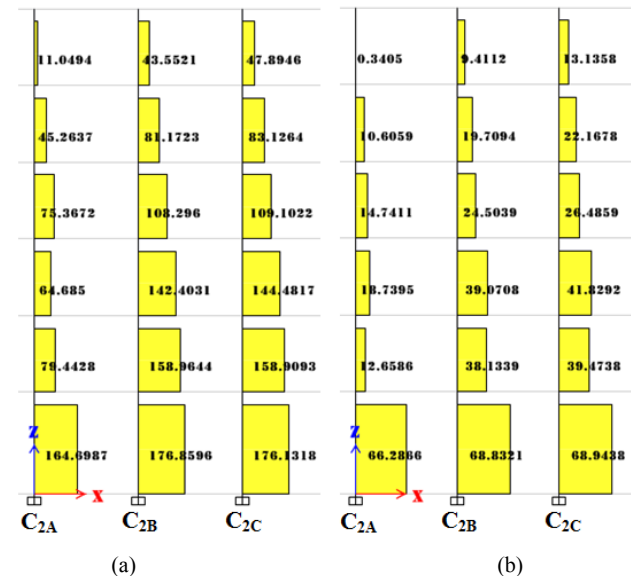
Column shearing force distribution for two models (a) bare frame (b) masonry infill frame
